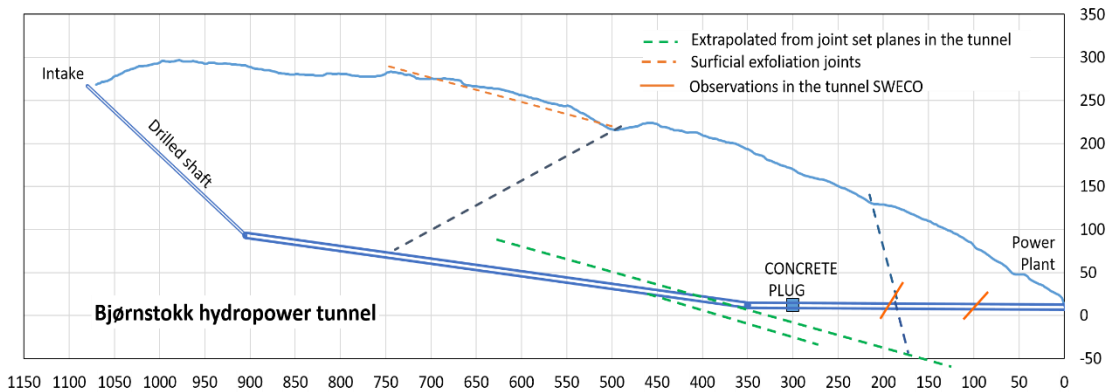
Vertical section showing the Bjørnstokk hydropower tunnel and rock joints.
